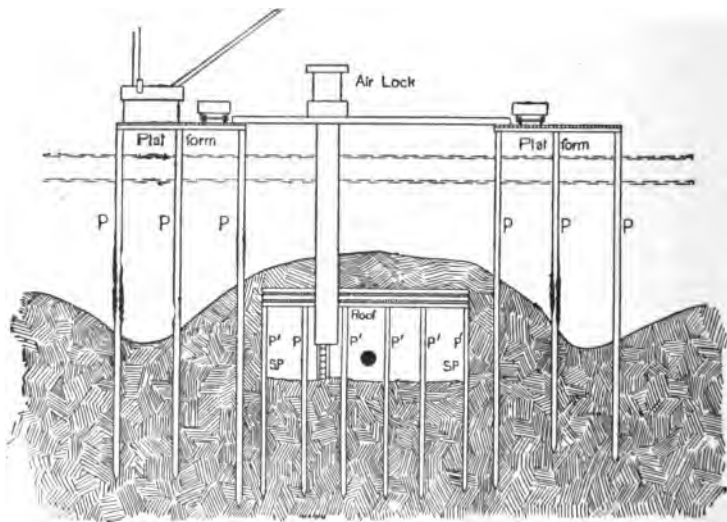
Diagram to show section of caisson under which part of the Harlem River Tunnel was built.
